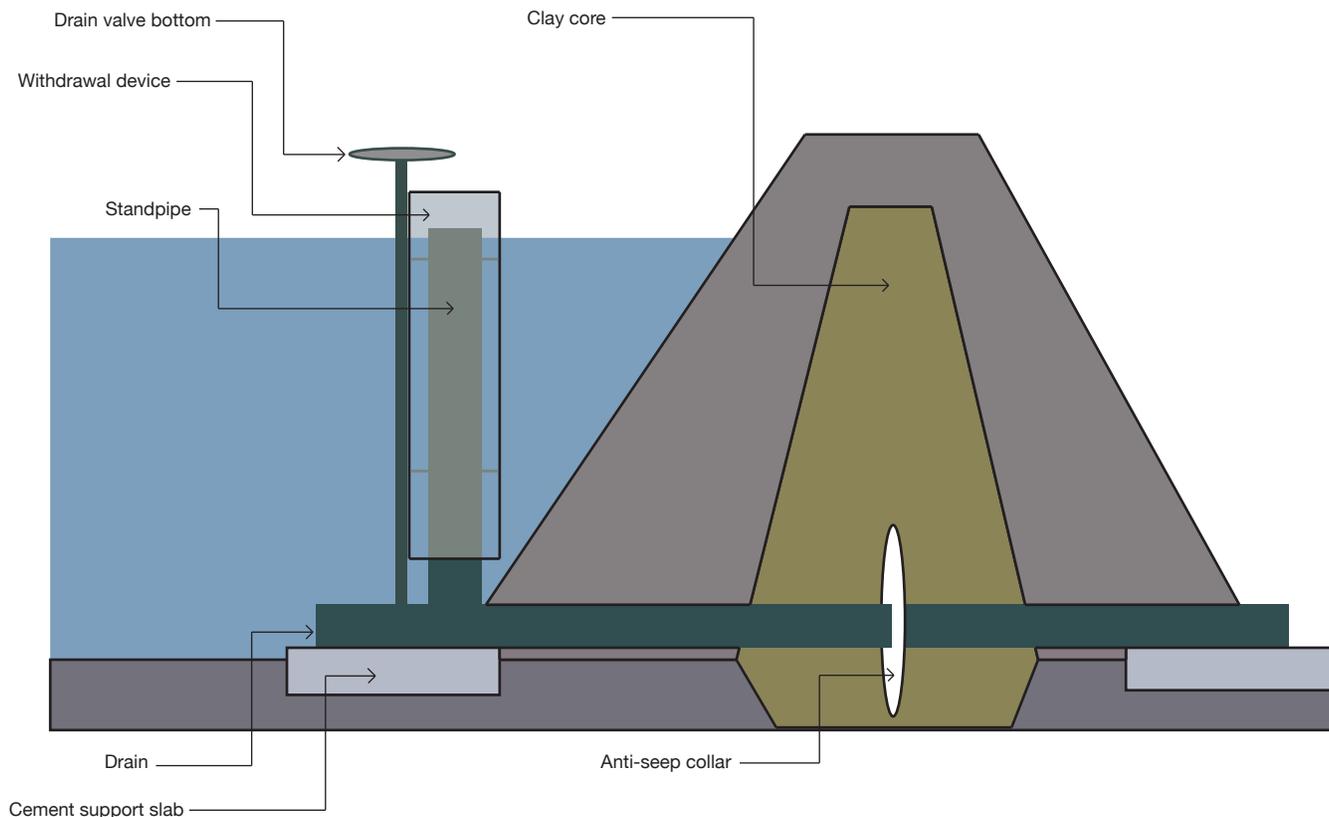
Diagram of a pond dam with drainage and water control structures. This design is common among irrigation lakes and levee ponds.
